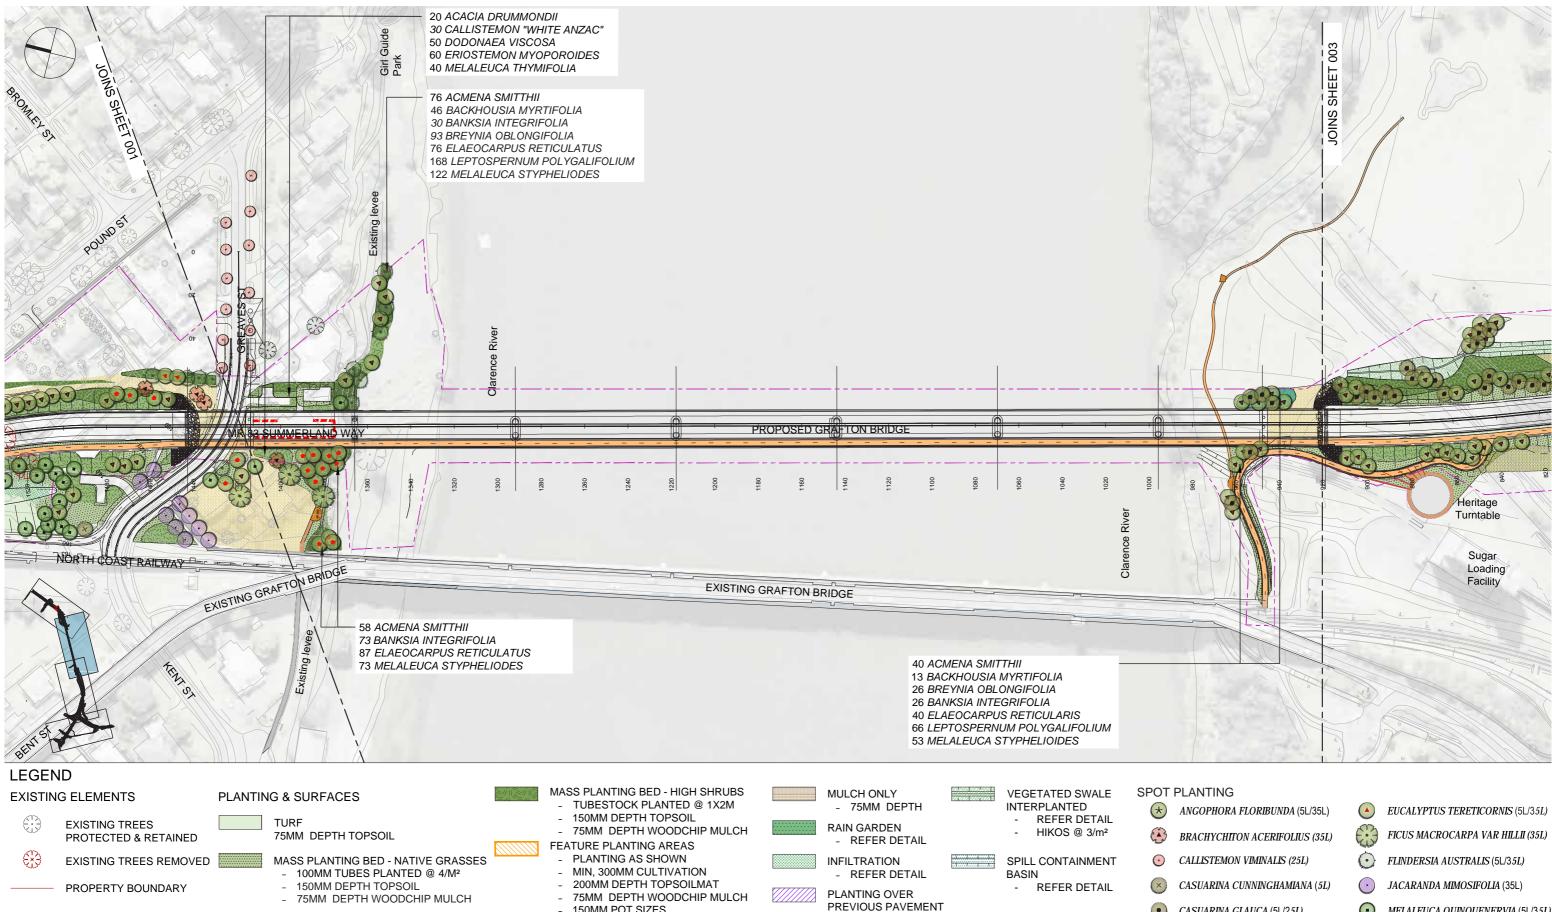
Planting Plans Conforming Detail - Pound and Clarence Streets (Scale 1:1000) - Sheet 1
